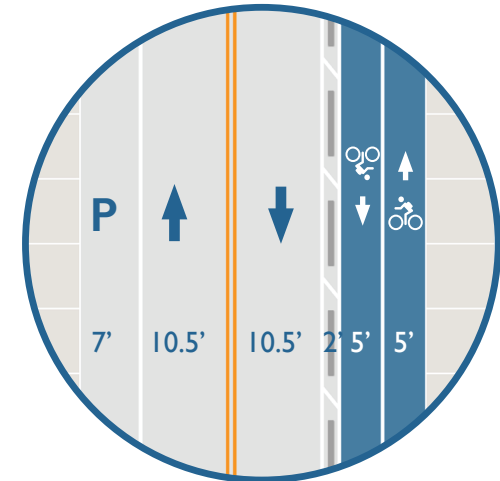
Street Layouts for a Common Somerville Street Width of 33 Feet
